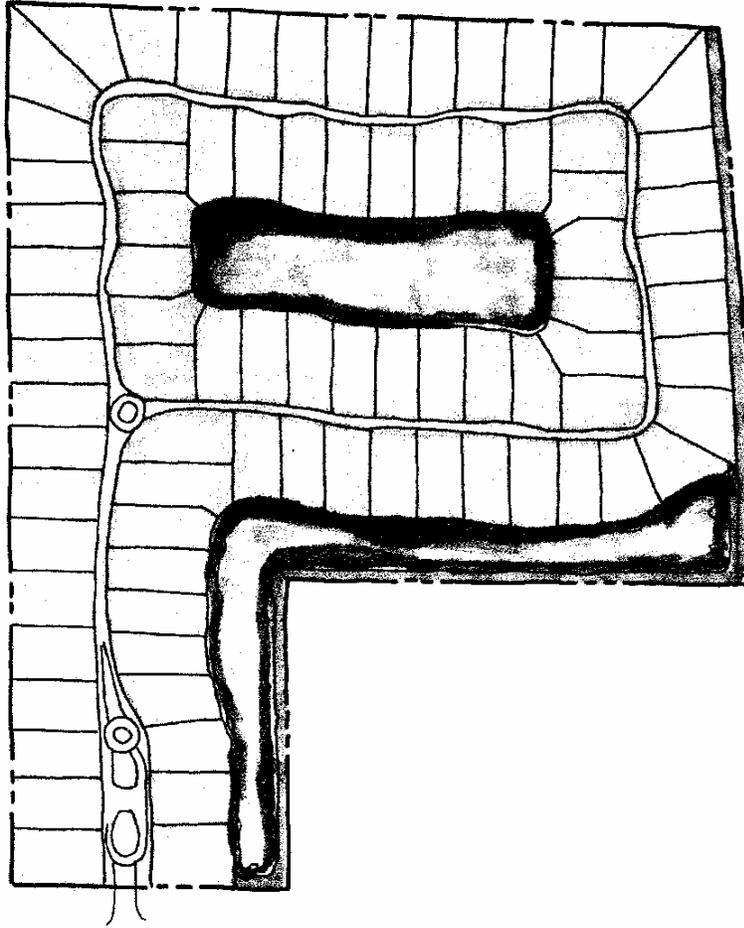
TYPICAL YIELD PLAN (84 LOTS)
